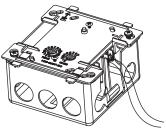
A. MODULE MOUNTING WITH BARRIER:
